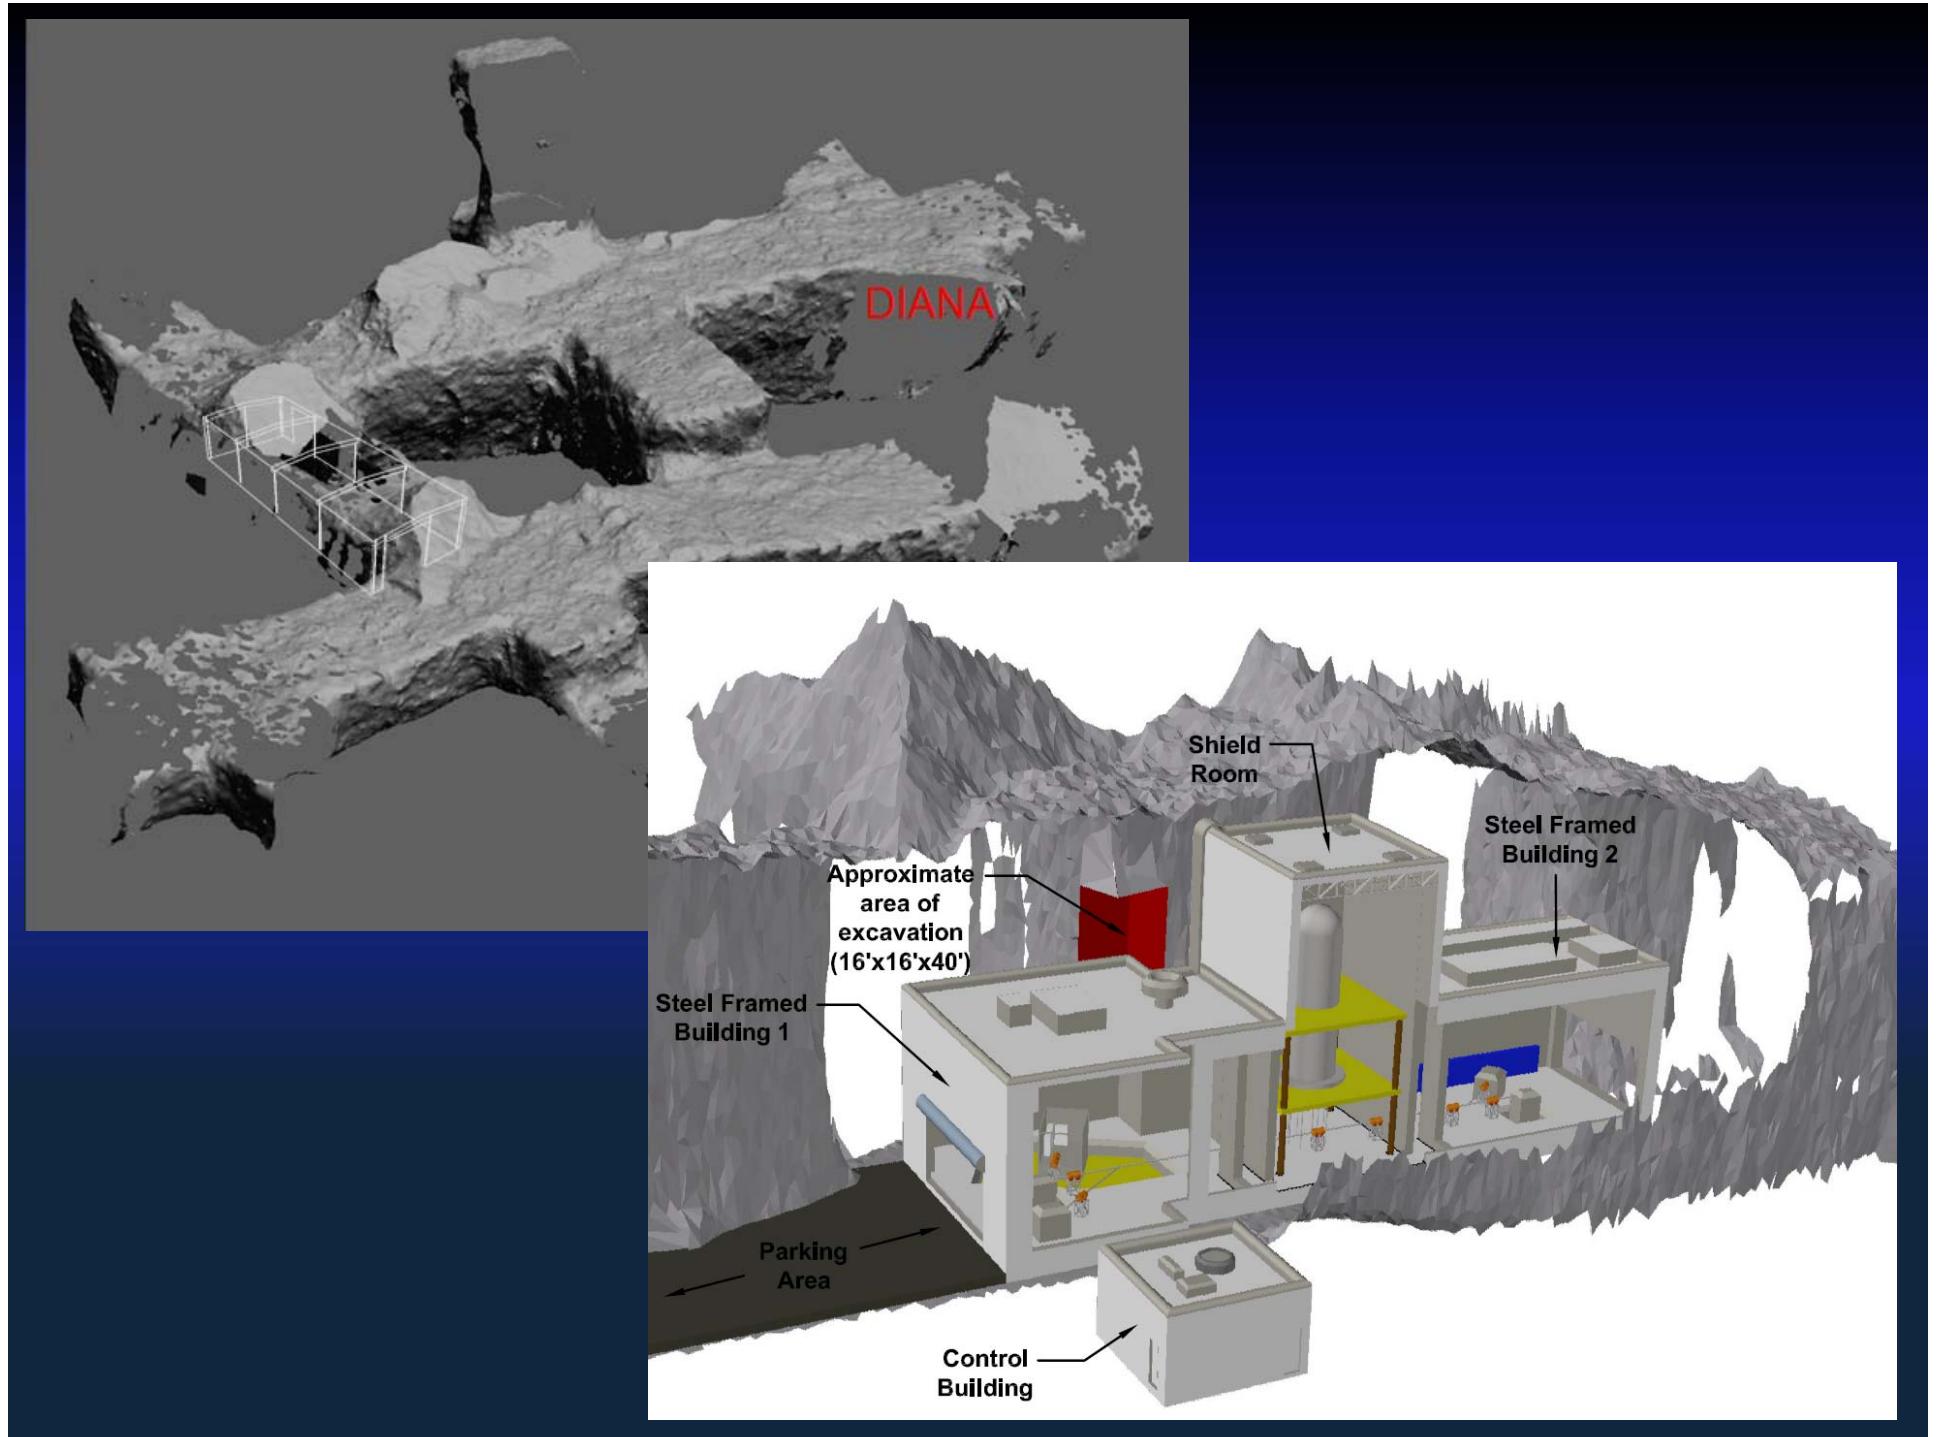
(continued): Cross-section and floor plan for DIANA located at KURF.
